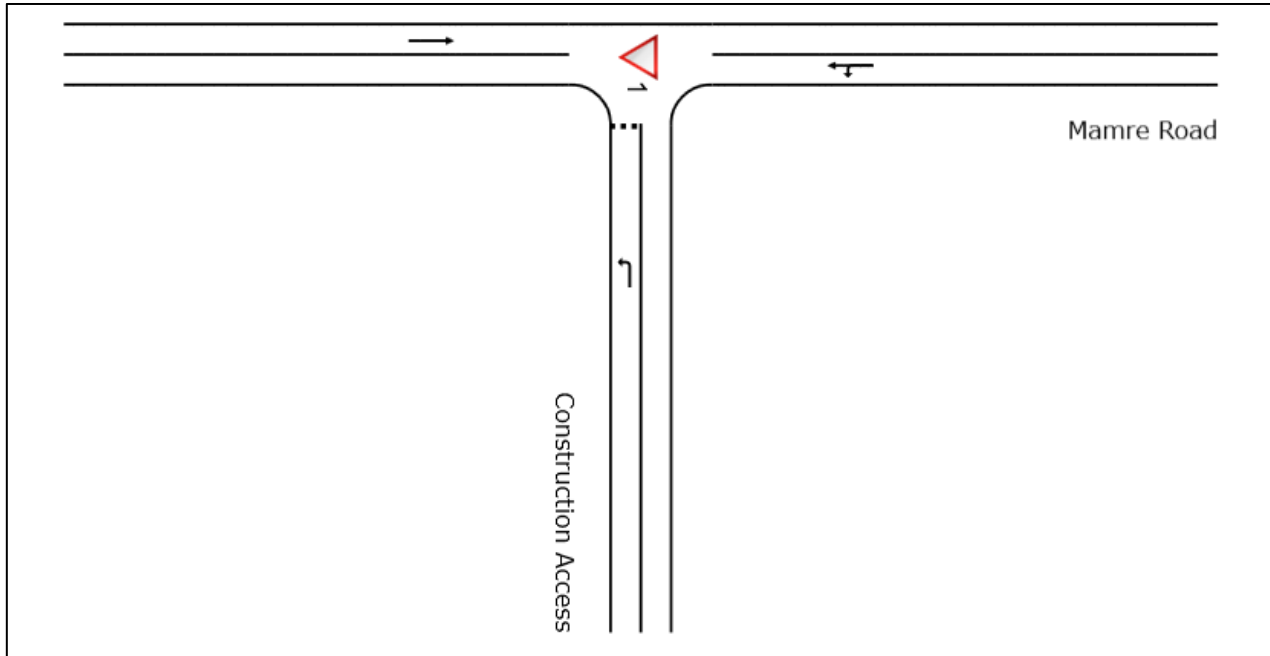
Interim Construction Access Layout Via Mamre Road / LILO
